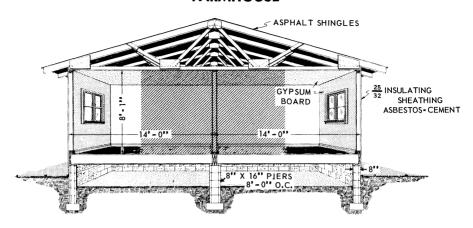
A one-story farmhouse with a truss roof. The shaded area in the center of the house is the area supported by the piers under the center of the house.
